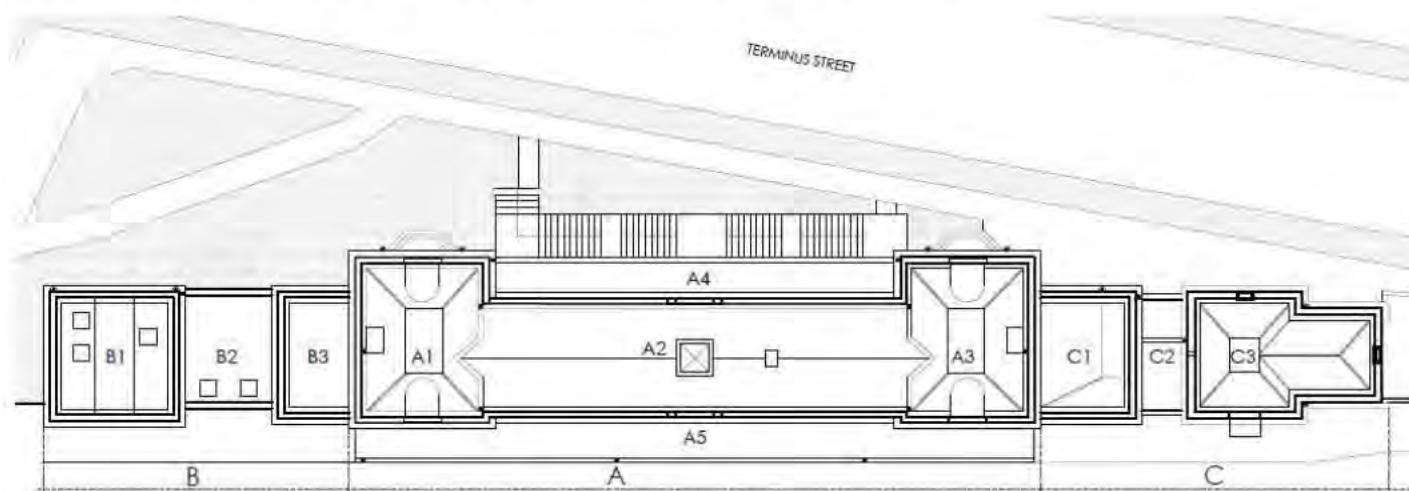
Existing roof and site plan of the 1885 Former Station Building, with further notations that are utilised in this Schedule of Works. Source: OCP Architects
